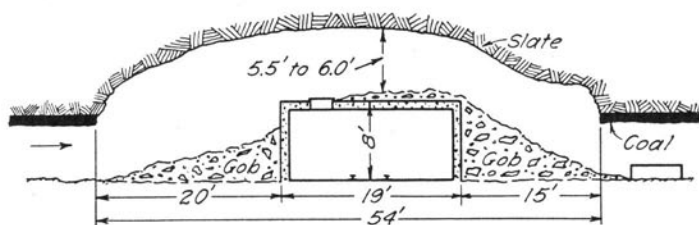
ELEVATION OF OVERCAST BETWEEN SECTIONS C_4 AND C
